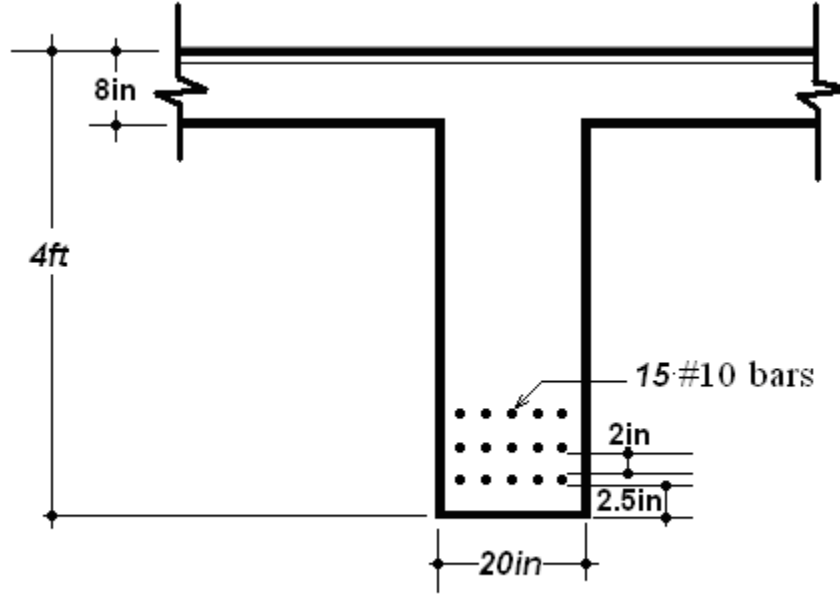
Cross Section of Interior Girder-Reinforcement Detail
